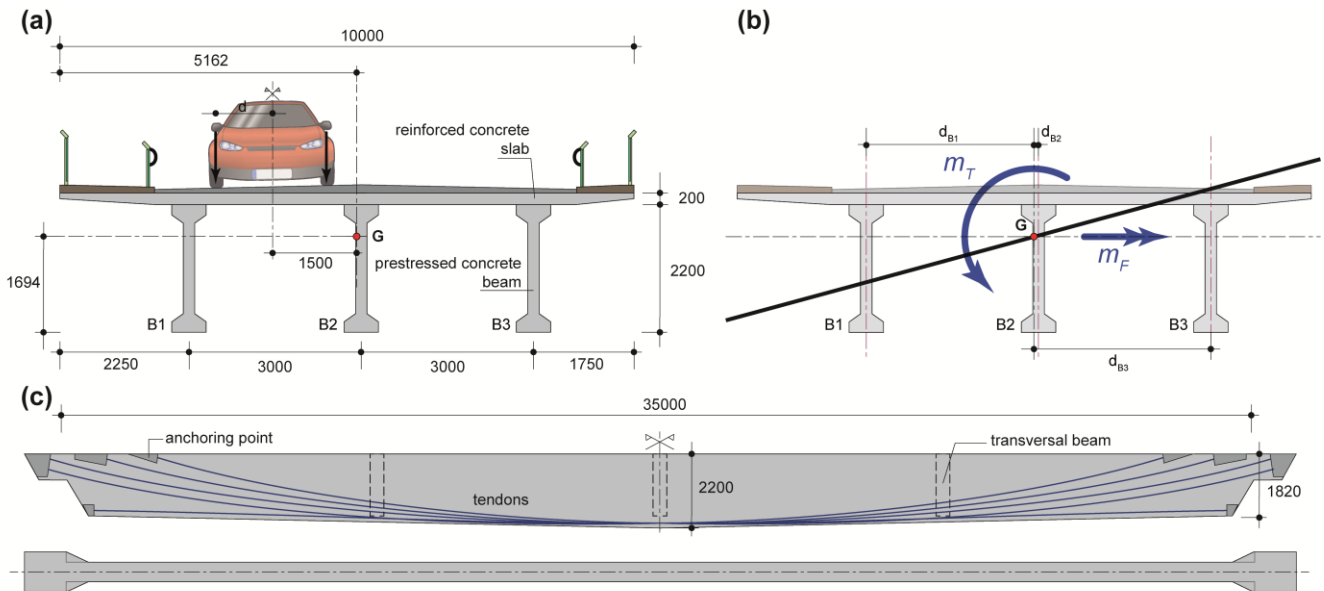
(a) Cross-section of the bridge deck. (b) Typical scheme to assess the effects on the external girder. (c) Side and top views of the prestressed concrete girder beams. Dimensions in mm.
